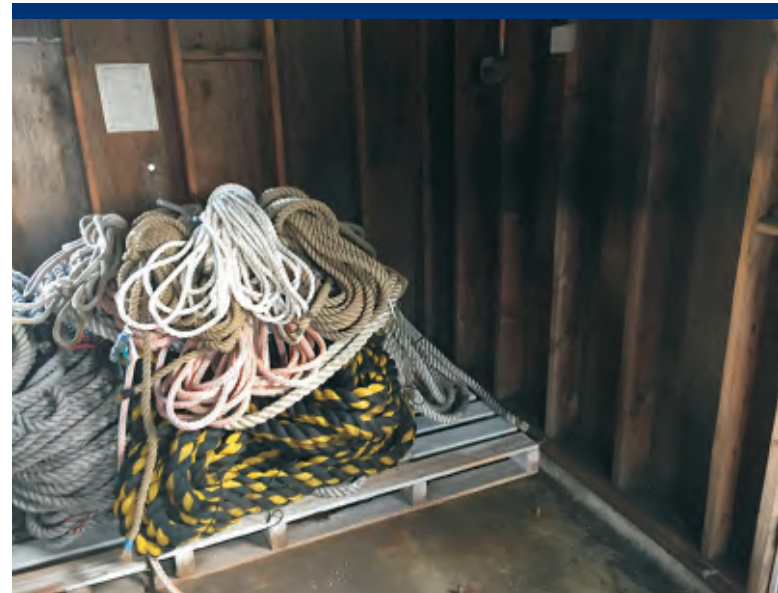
Discolored concrete at southeast corner of cutoff saw room.
